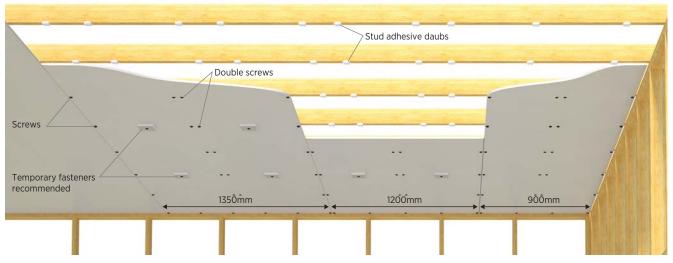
Combination adhesive and screw fixing to ceilings - conventional method
